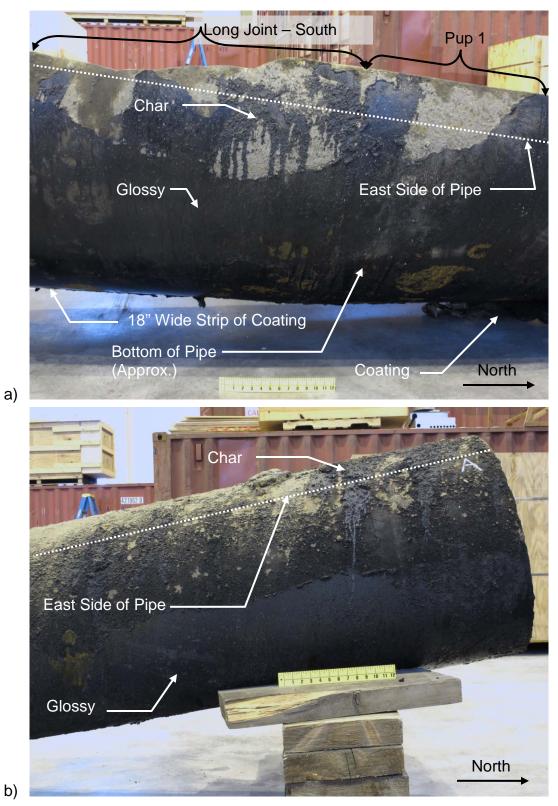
Condition of the asphalt coating on the center section; a) East side / bottom of long joint and pup 1; b) East side / bottom of pup 4 adjacent to girth weld fracture.
